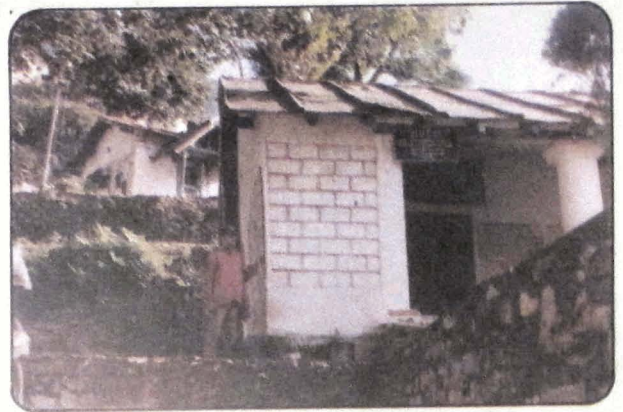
Northward bulging in short wall of Okhimath Public Health Centre.
